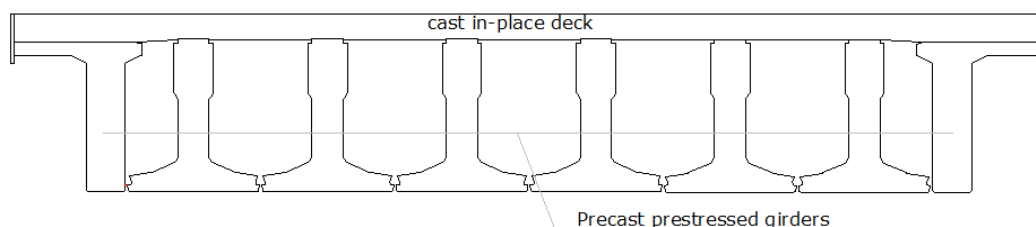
1, Actual cast in-situ deck on precast prestressed girders
